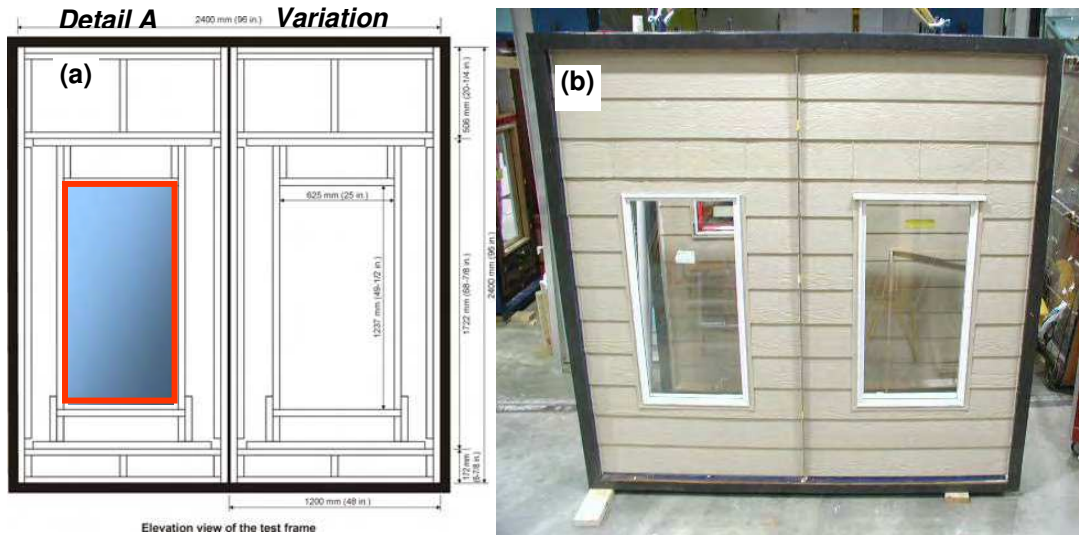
(a) schematic of front elevation of 2.44-m by 2.44-m (8-ft. by 8-ft.) specimen showing location of 600 mm by 1200 mm (2-ft. by 4-ft.) windows and adjacent wood framing studs. Detail “A” might be representative of installation details used in current practice whereas detail “V” a variation on that practice; (b) photo of a completed specimen clad with hardboard siding.
